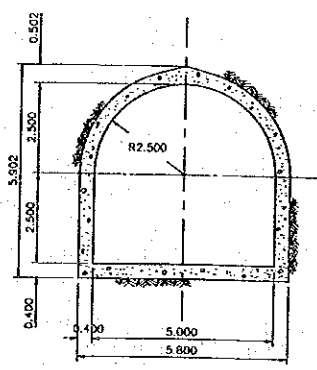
Profile and Typical Cross Section of BR-1 Waterway
